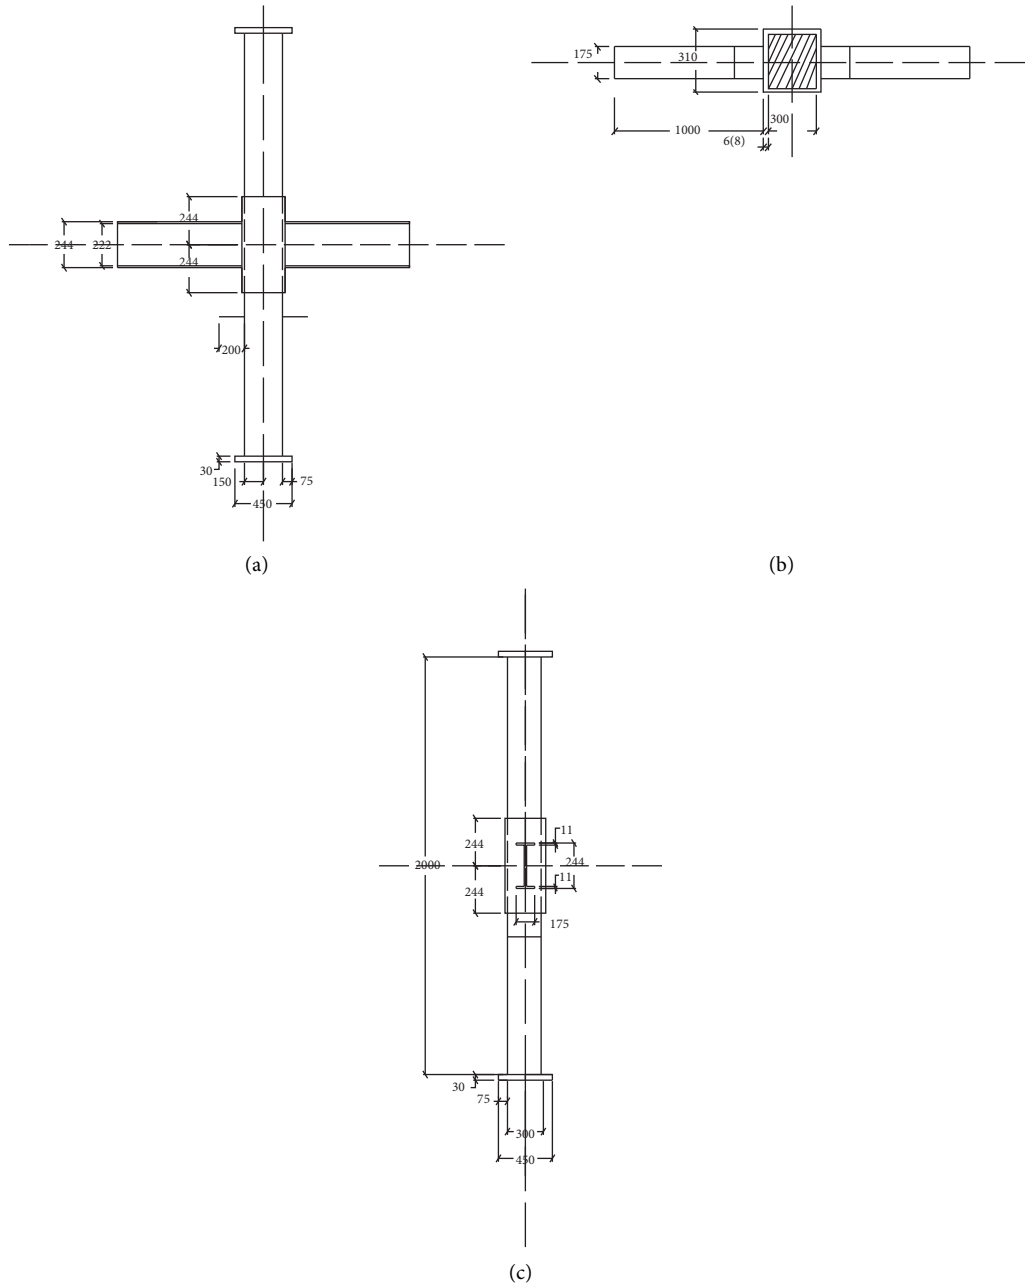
Detailed joint structure. (a) Elevation, (b) plan, and (c) profile.
